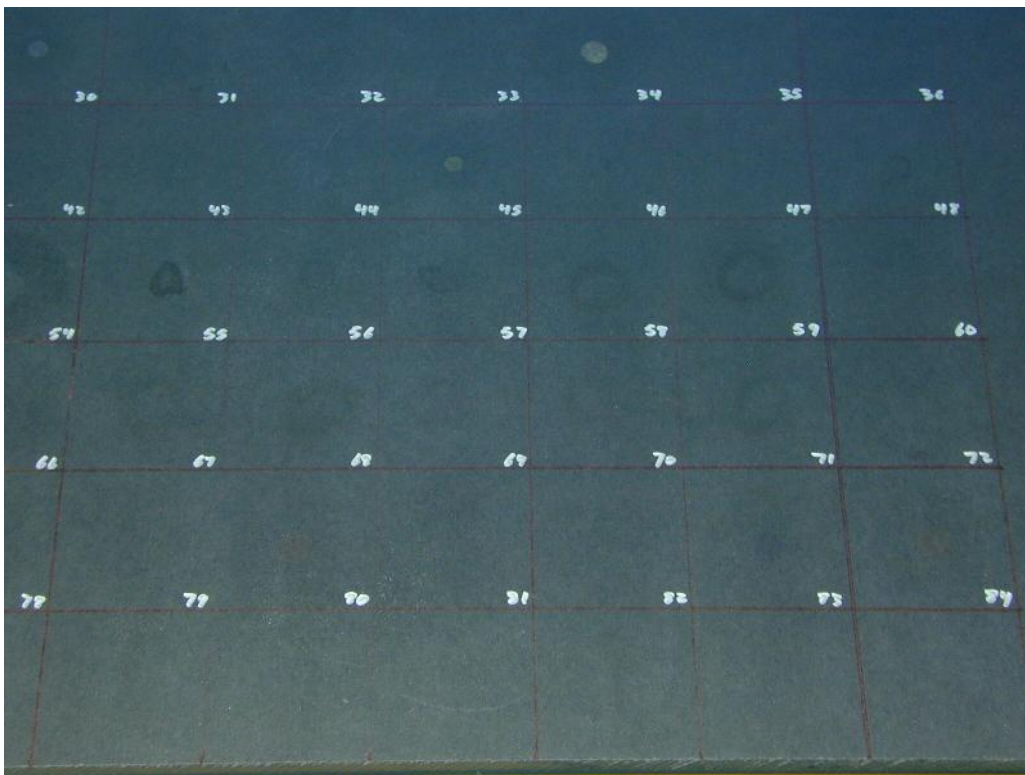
Overall view of the bottom right quadrant, after exposure.
